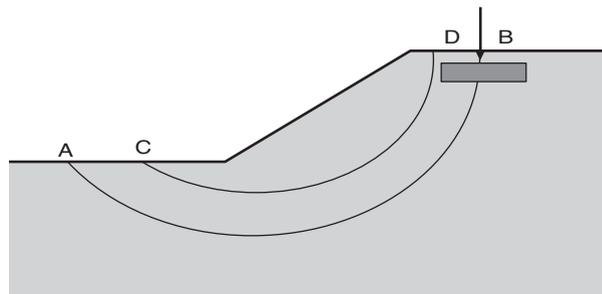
Overall stability has to be checked for failure surfaces A–B and C–D. The failure surface C–D passes outside of the foundation but, if slope movement occurs, the vertical bearing resistance of the foundation is substantially reduced
